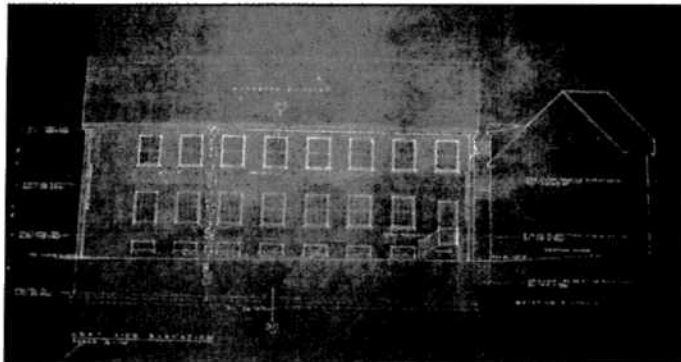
1950 addition. Side elevation drawing by McLeod & Ferrara showing articulation with 1920s frame Colonial Revival.
